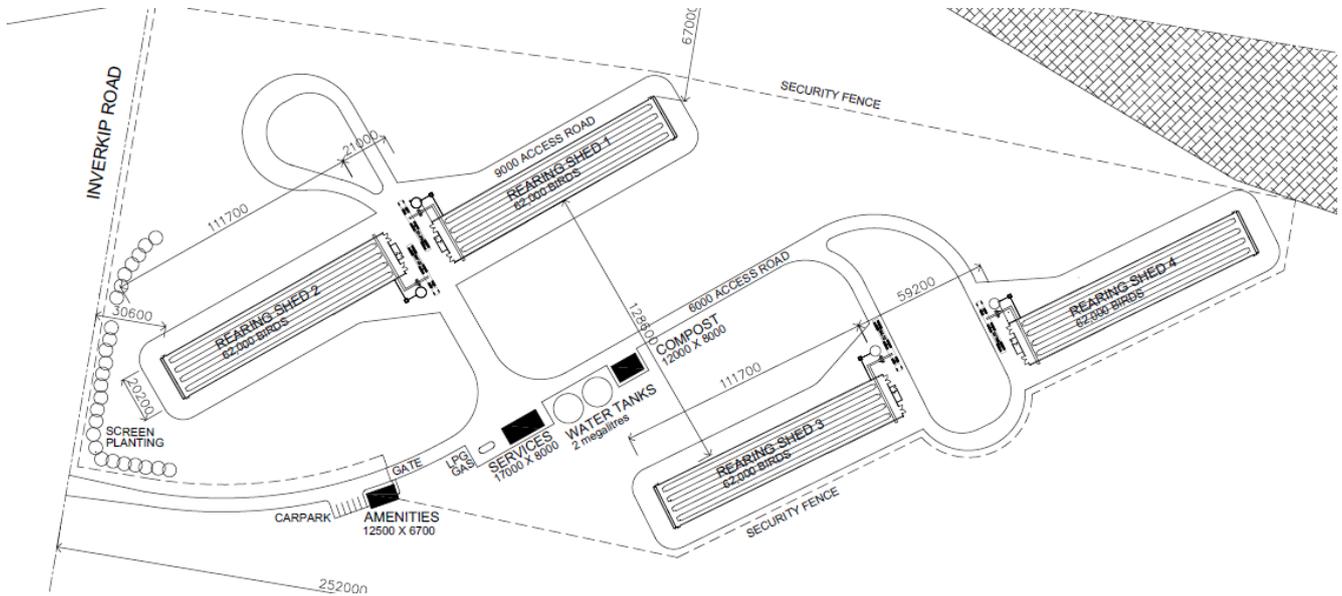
Proposed Site Layout Plan (Source: Pace Farm)
